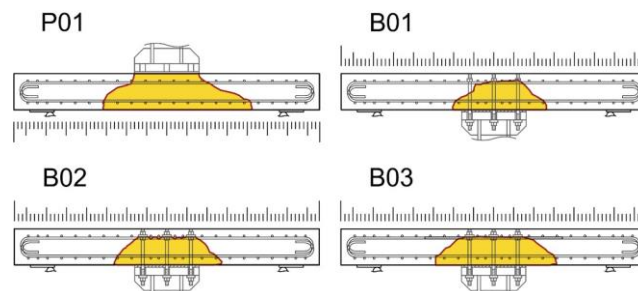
Specimen failure surface, typical cross sections.
